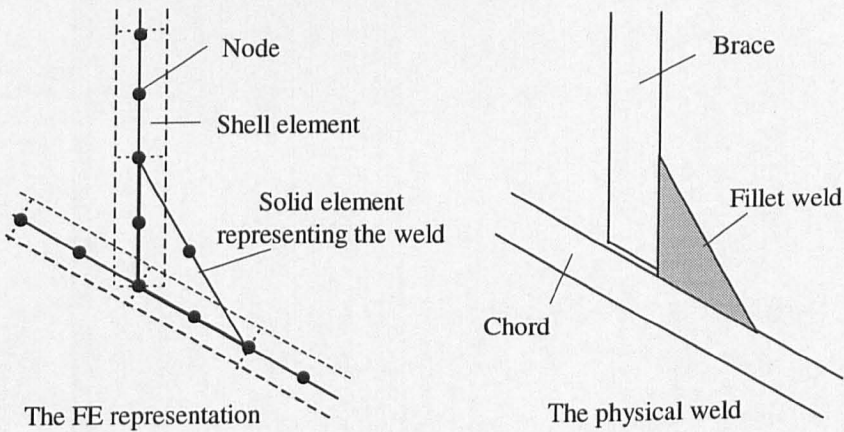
Example of the detail when a fillet weld is assumed
